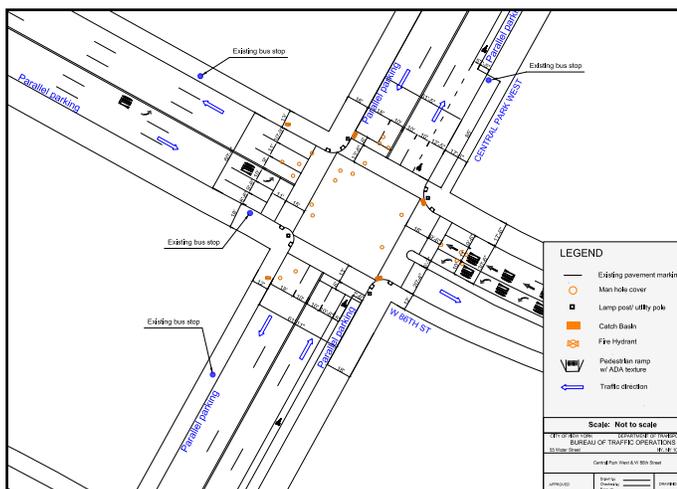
Existing Condition - Central Park West & West 86th Street
